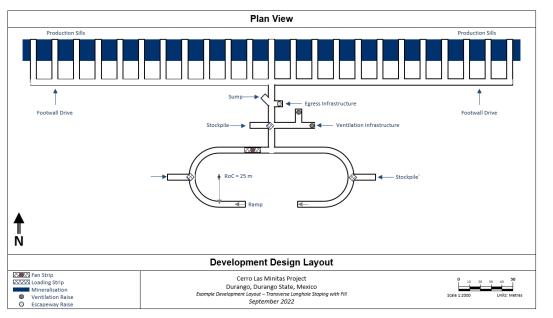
Cerro Las Minitas Transverse Longhole Stoping Level Layout
